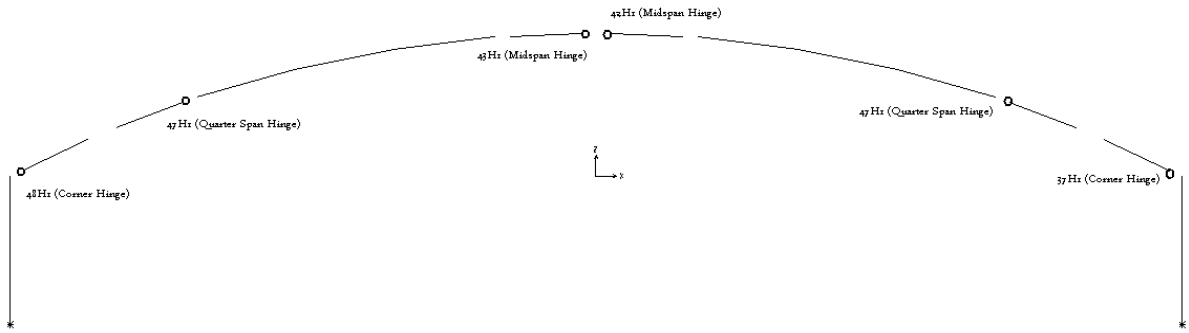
Hinge Locations and Labels – 36 ft Clear Span Model
